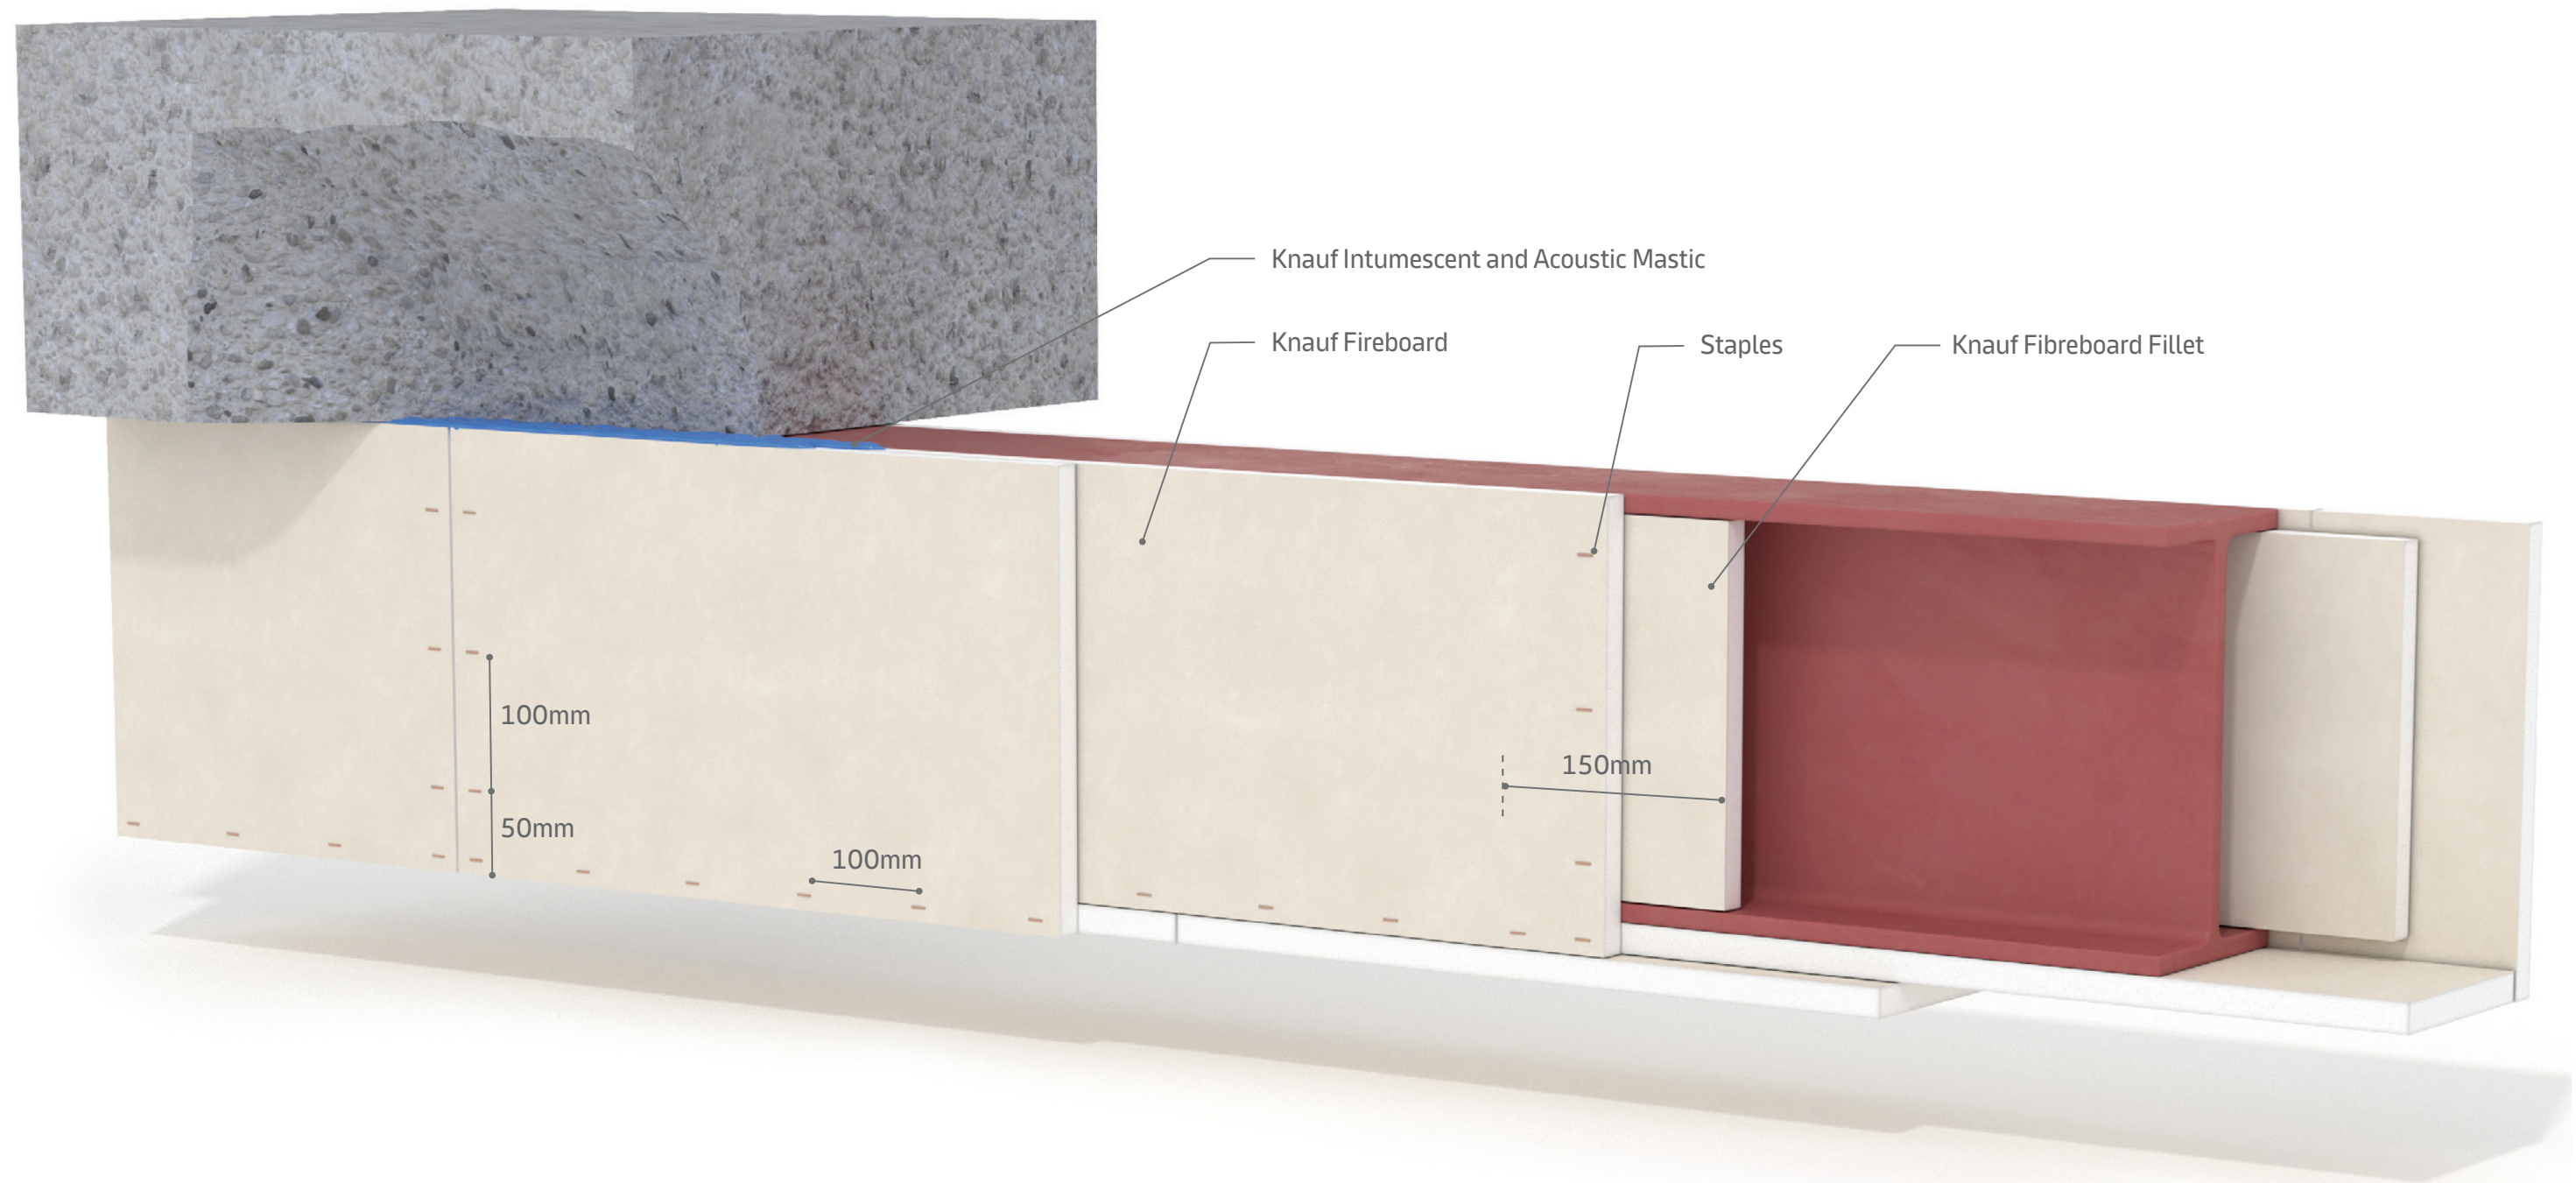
Isometric view of a 3-sided, double layer of Knauf Fireboard protecting Universal Steel Beam
